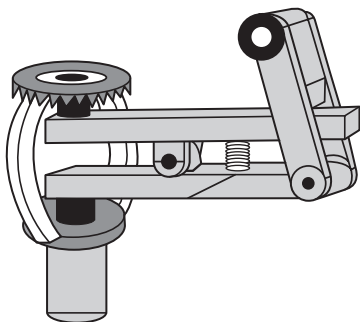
Sprinkler with Sprinkler Wedge Installed.
